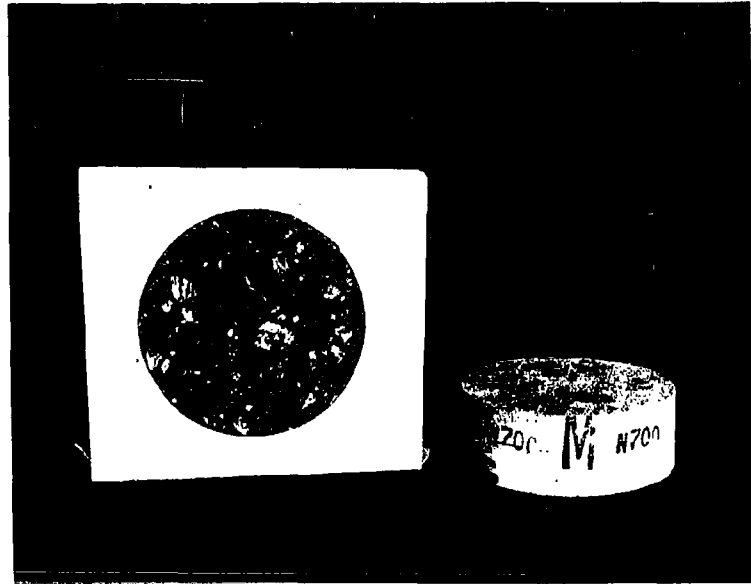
Plaster of Paris casting around concrete cylinder to prevent chipping of concrete at breakthrough of stone saw.
